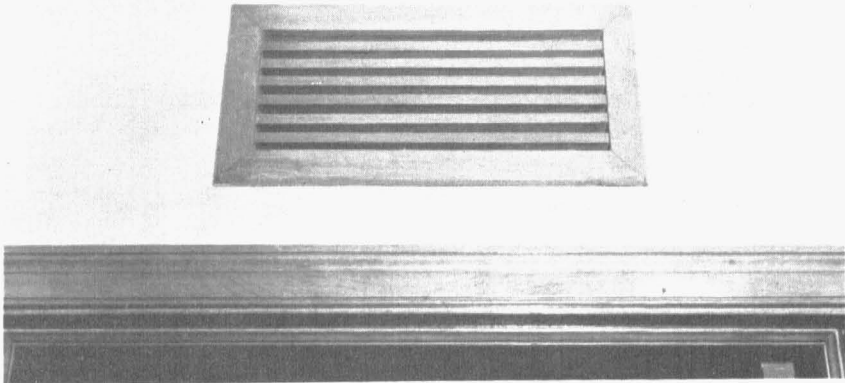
Louvered transom openings over doors will allow warm air circulation even though the door is closed. These openings should be made large as possible.
